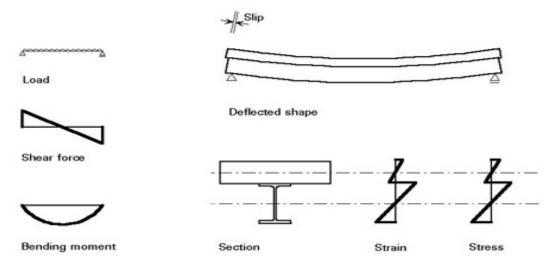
Behaviour of non-composite concrete slab resting over steel beam (<u>http://www.corusconstruction.com</u>)
